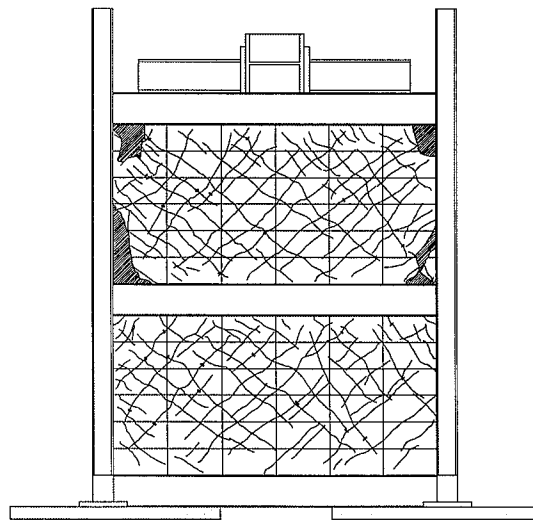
Cracking Patterns of RC Infill Wall in Specimen
